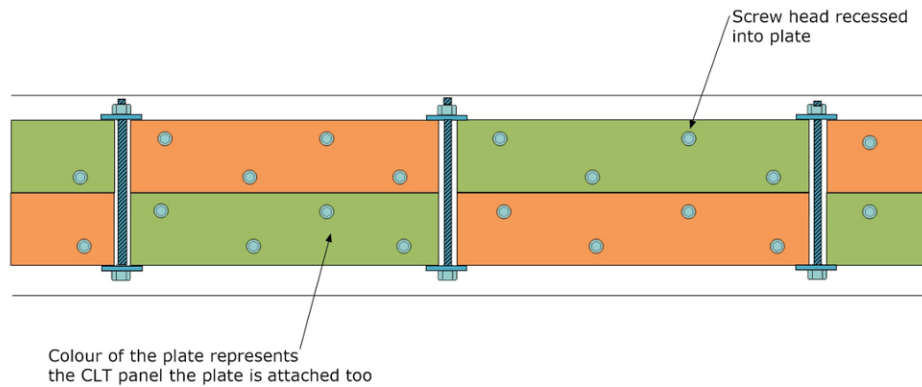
continued: Mechanical Connection using Metal Plates and Screw and Bolt Fixed
